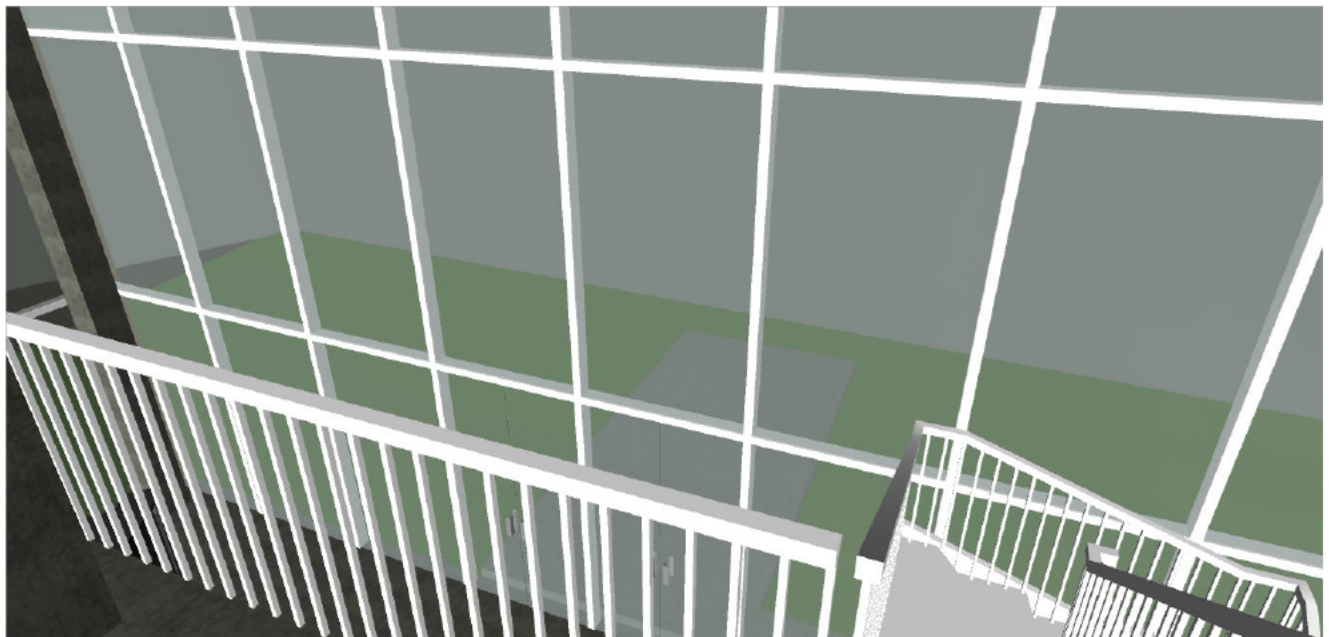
Interior View - Mezzanine Floor - Looking into Atrium Below
